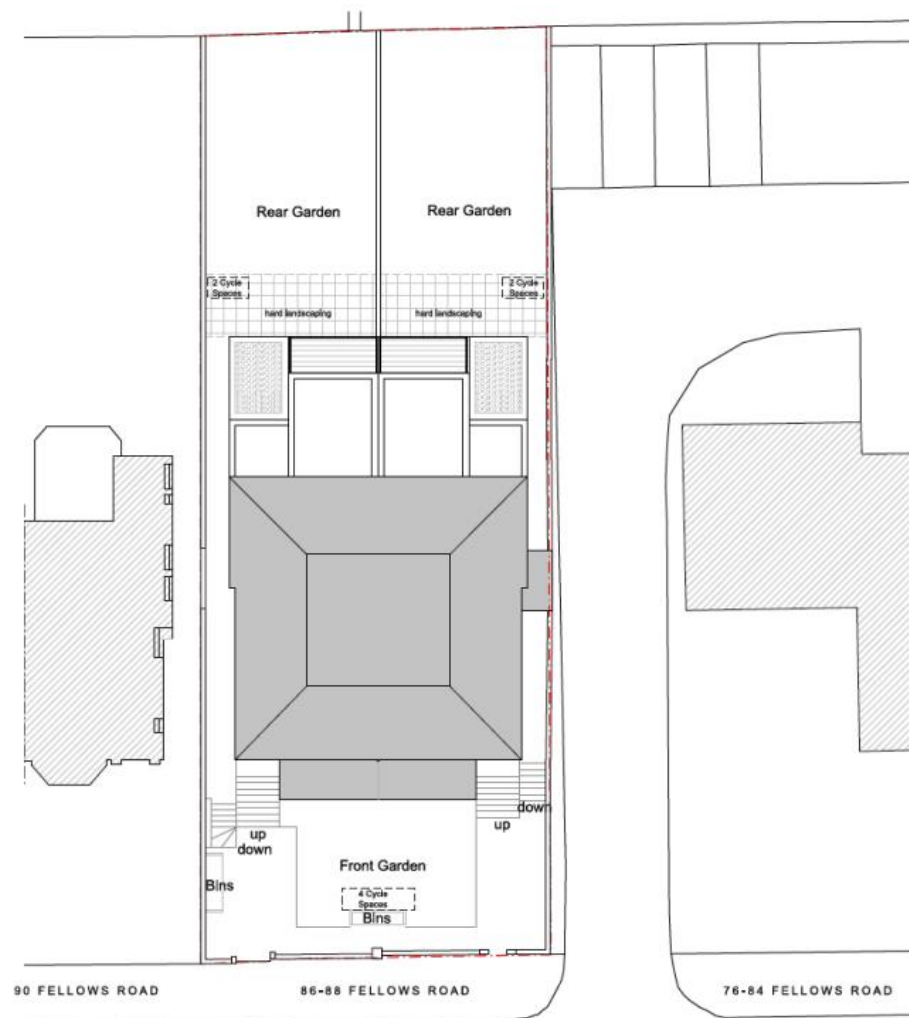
Proposed Site plan showing the extent of the proposed extension.
